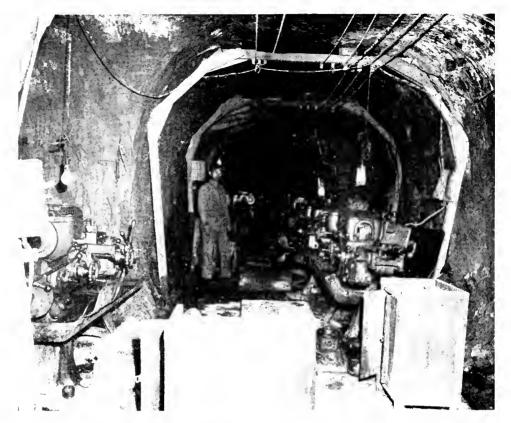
Handa plant. Tunnels in sand mines near Tsu City.
